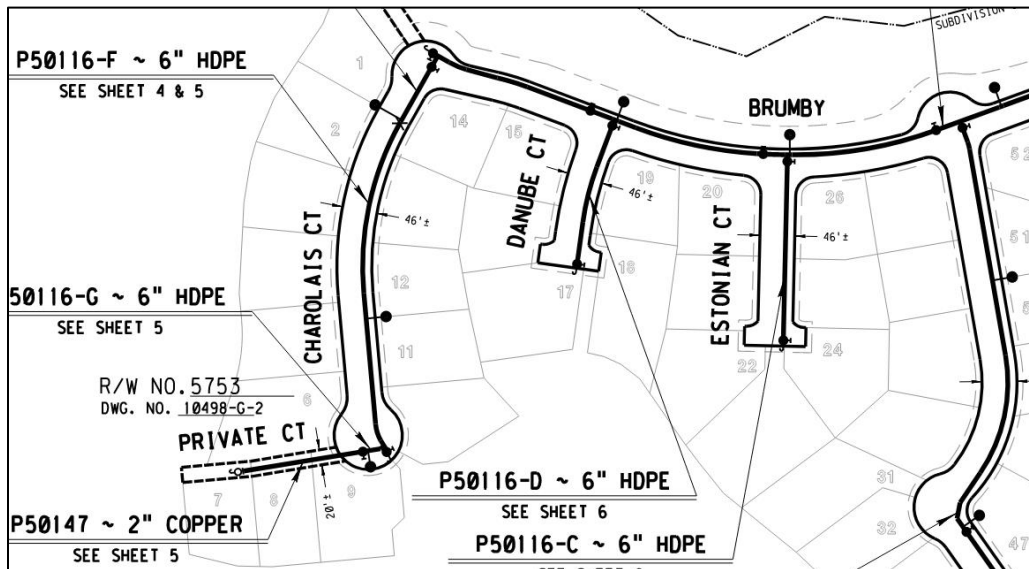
Cover /Plan Sheet for Applicant Main Extension Project with one Plan Sheet
